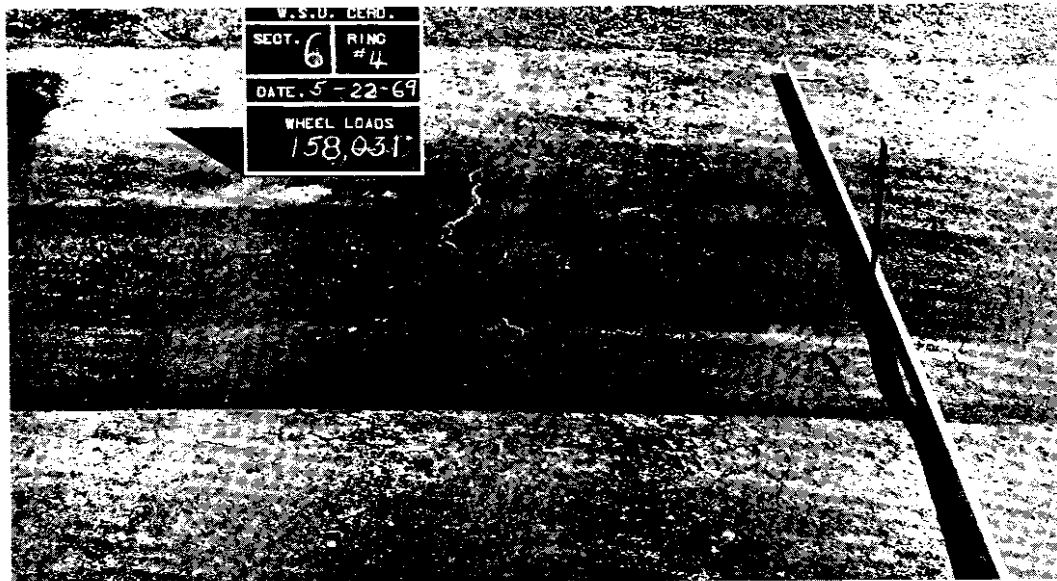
CLOSE-UP VIEW OF SECTION 6 AFTER 158,031 WHEEL LOADS. NOTE THE WIDTH OF TRANSVERSE CRACKS AND THE FORMATION OF LONGITUDINAL CRACKS AT THE EDGES OF PATH.
